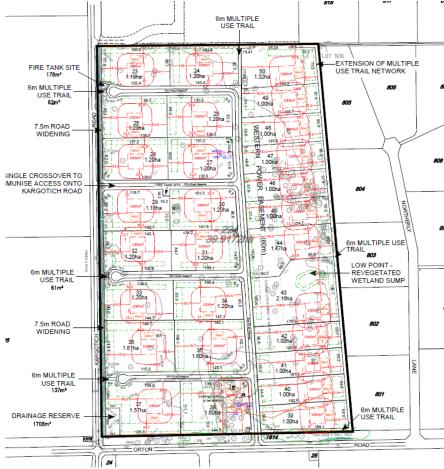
Subdivision Plan with Building Envelopes and Revegetation Areas
